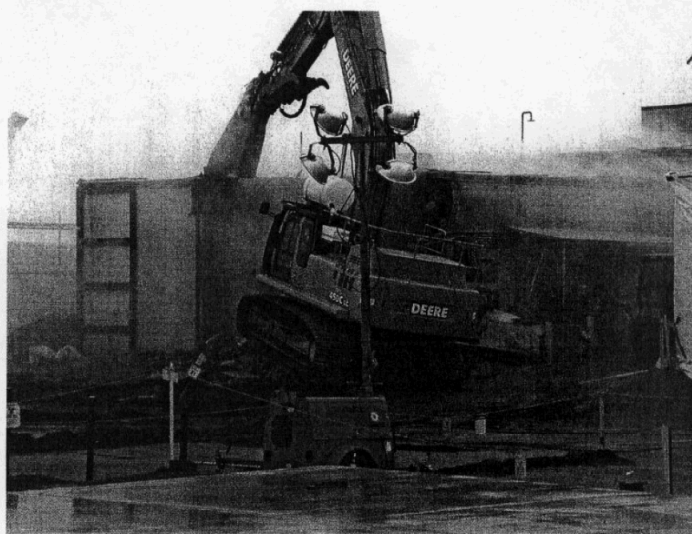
Misting equipment was installed on 232-Z, the surrounding buildings, and the demolition excavator.
